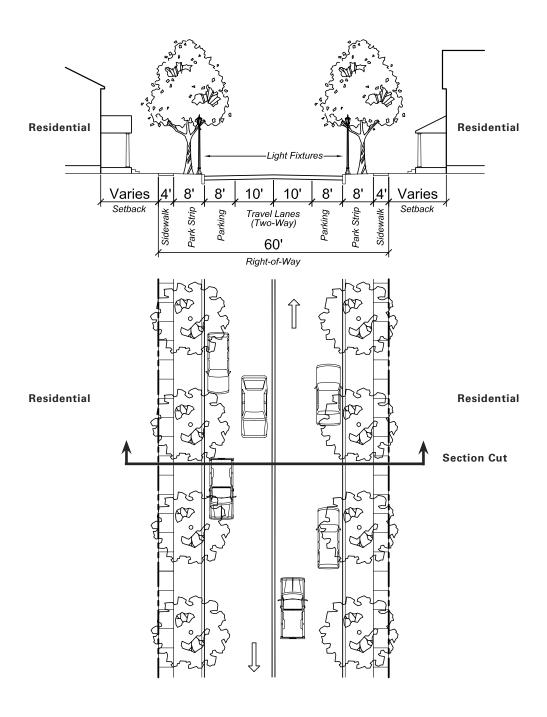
Proposed Section and Plan: Neighborhood Street A
